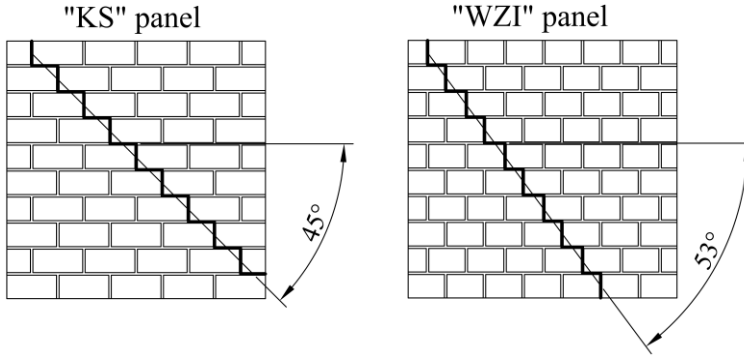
“Stepped-stair” cracks inclination
